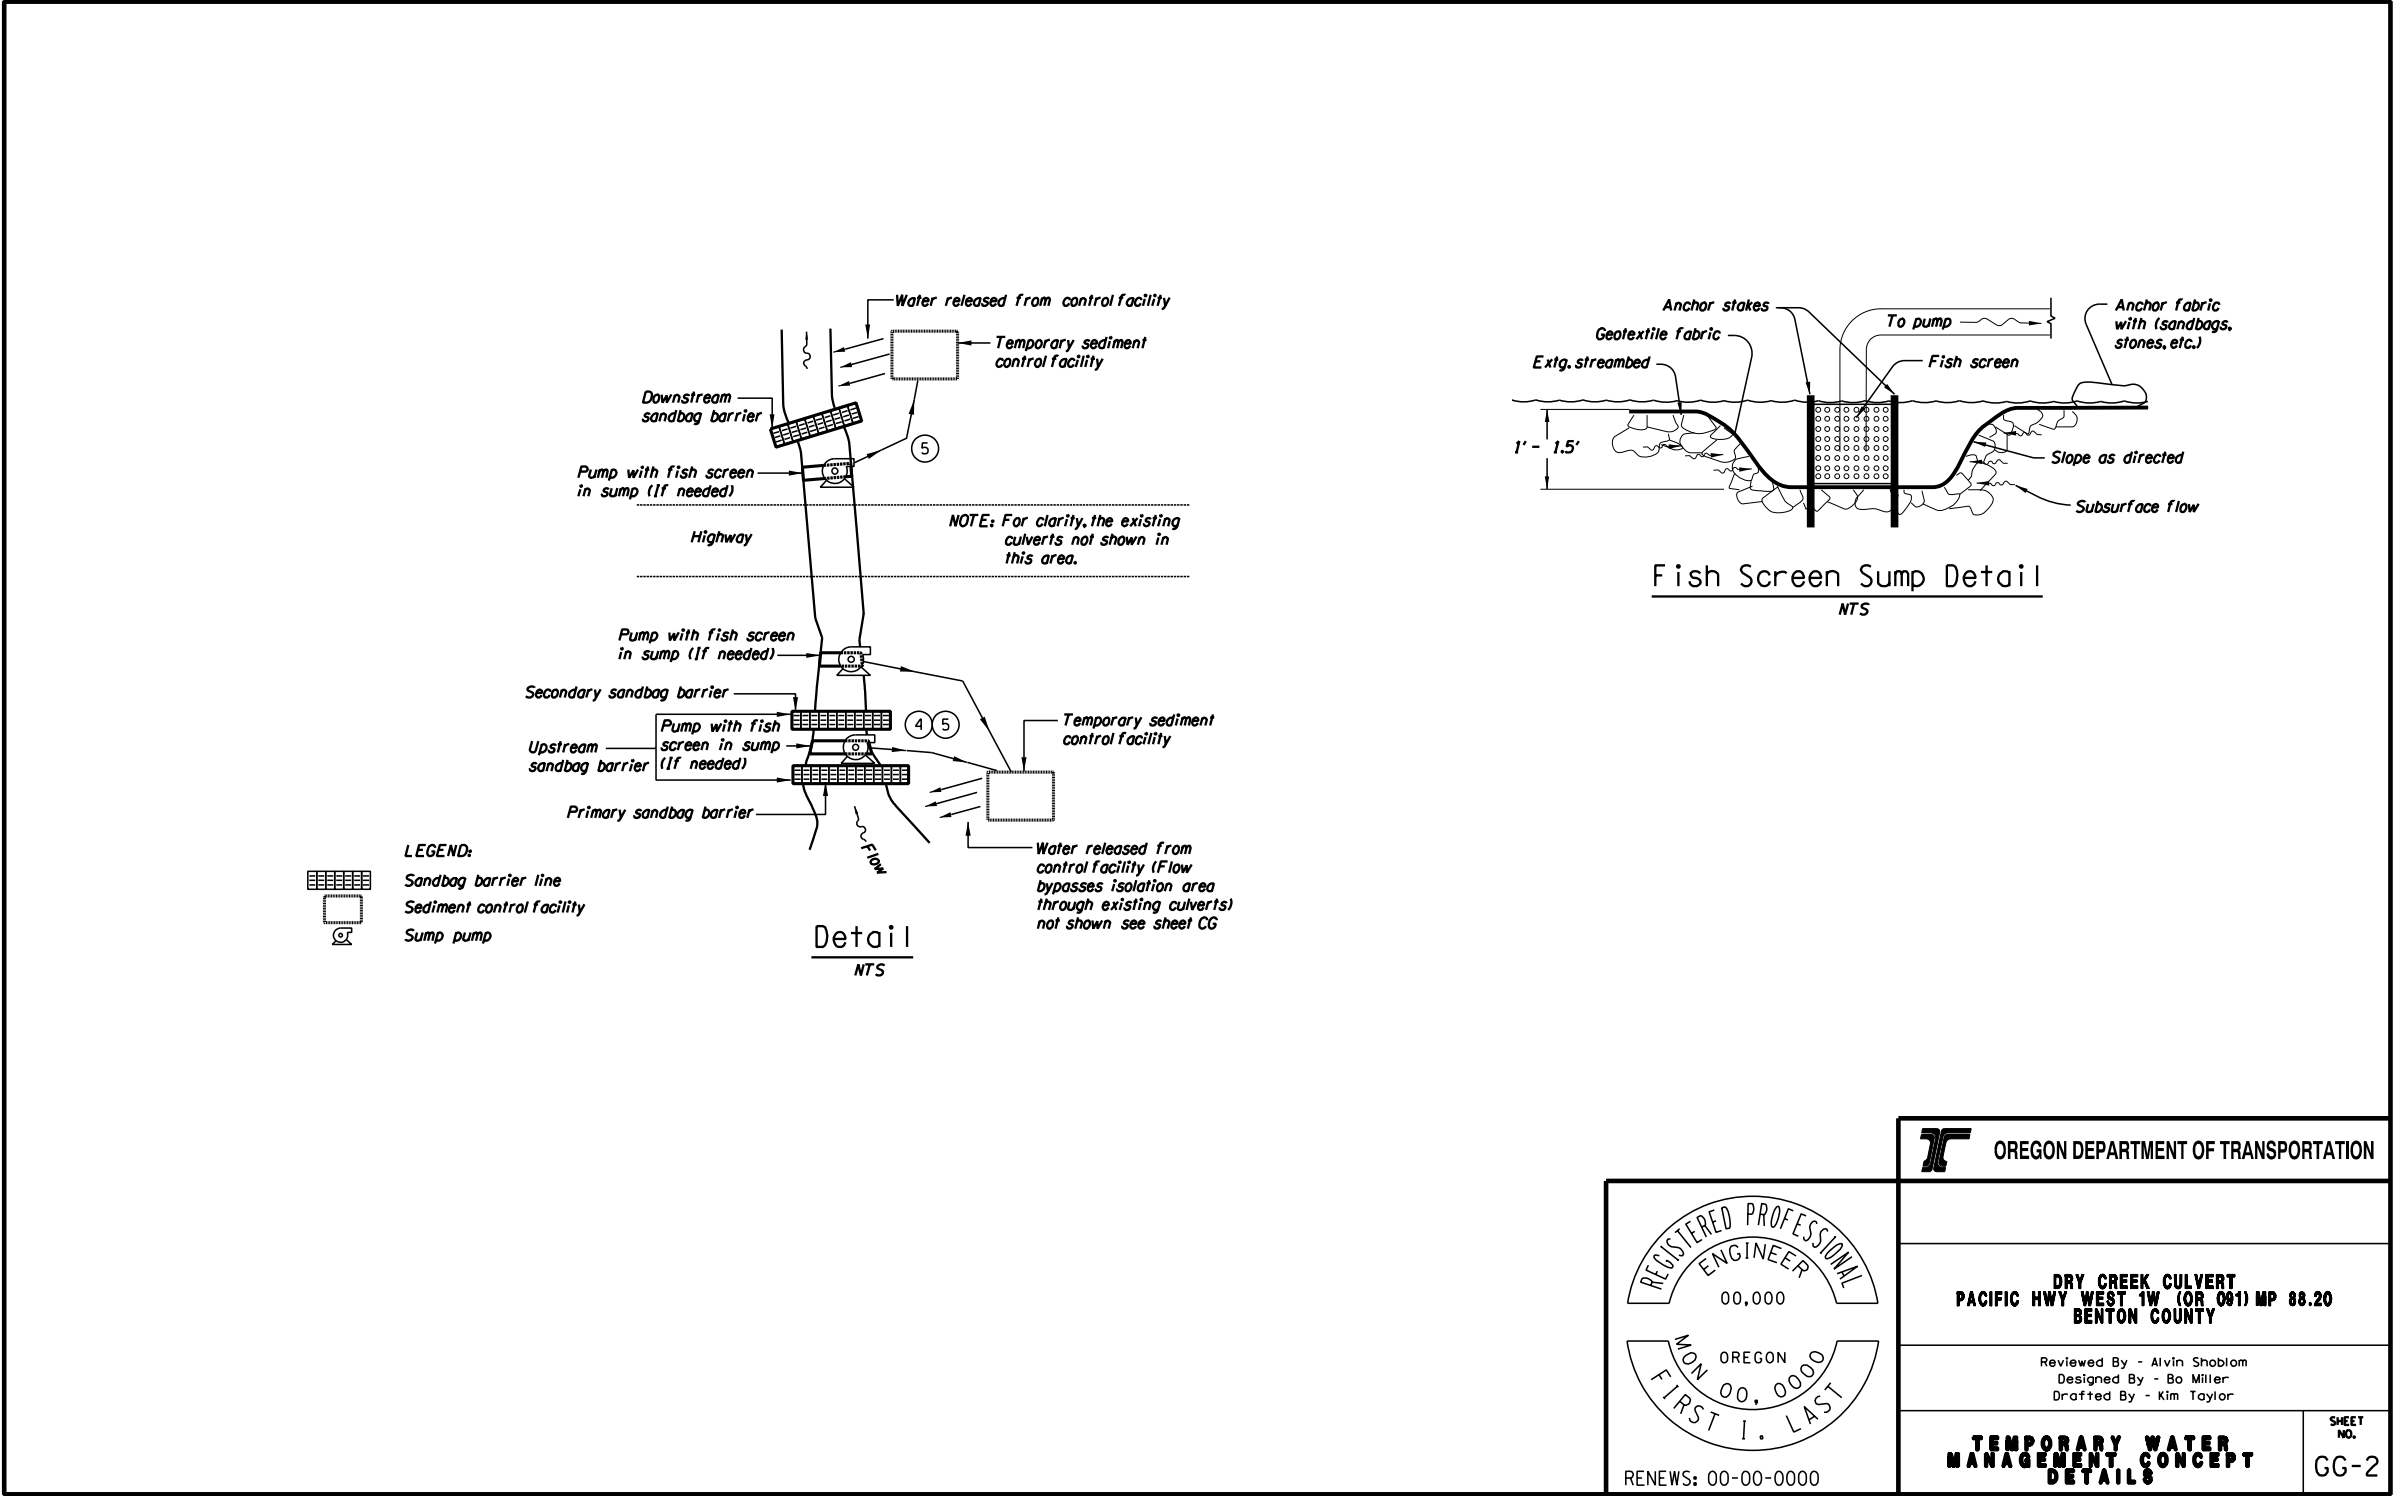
Example Drawing of a TWM Concept Plan (Full Isolation Page 2)
